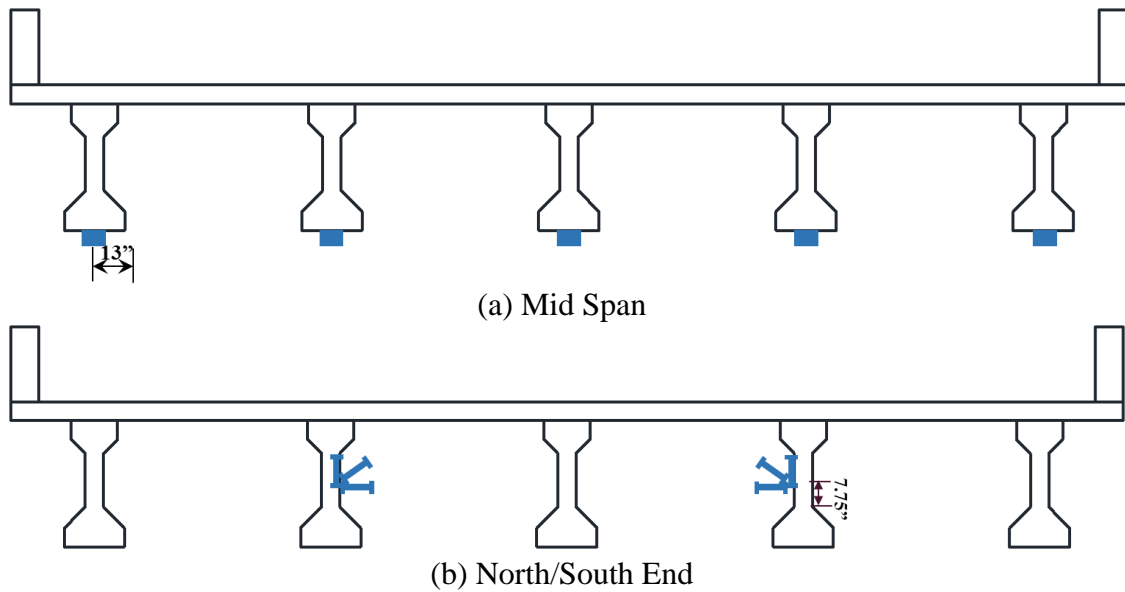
Sensor Layout for Bridge #2 (Cross Sections Looking North).
